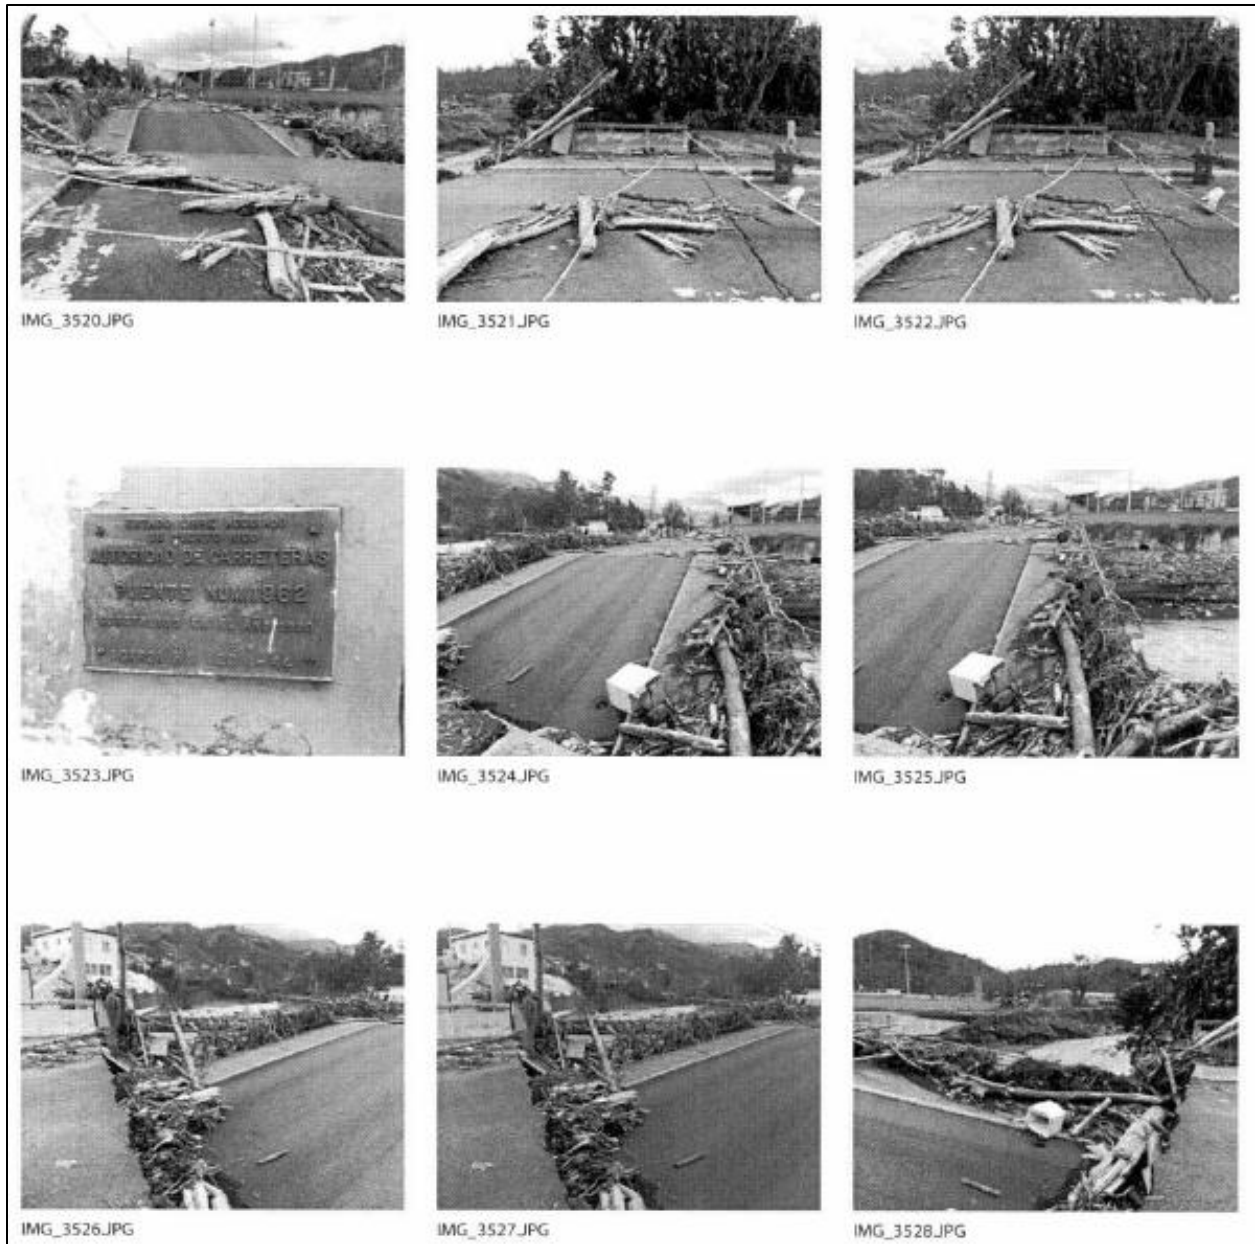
Bridge 1962 photos from September 23, 2017 inspection (source: PRHTA)
